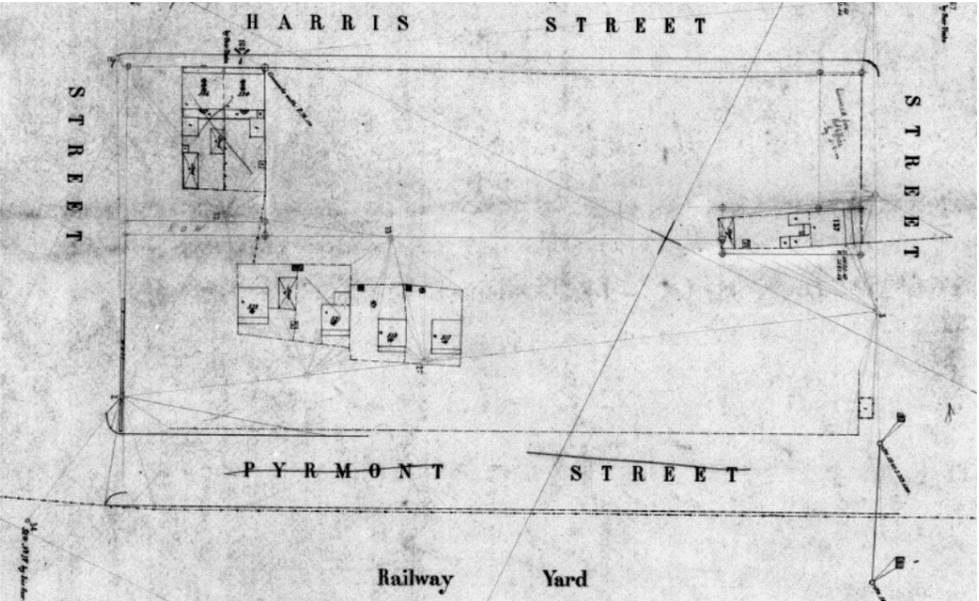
1886 plan of northern block (William Henry St to Macarthur St) of current Powerhouse Museum site, depicting houses at 137 William Henry Street, 517-523 Pyrmont Street, and 554-556 Harris Street. (Source: Sydney Water PWDS 1544-S206)
